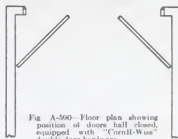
Floor plan showing position of doors half closed, equipped with "CornR-Wise" double door hardware.
